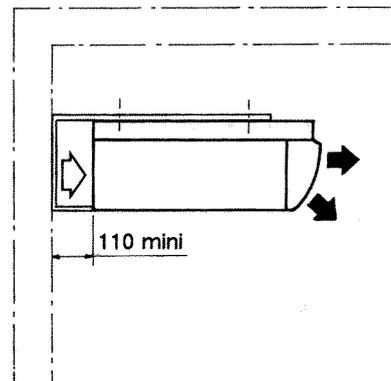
Floor mounted, with support feet (support feet kit with assembly drawing is optional).
